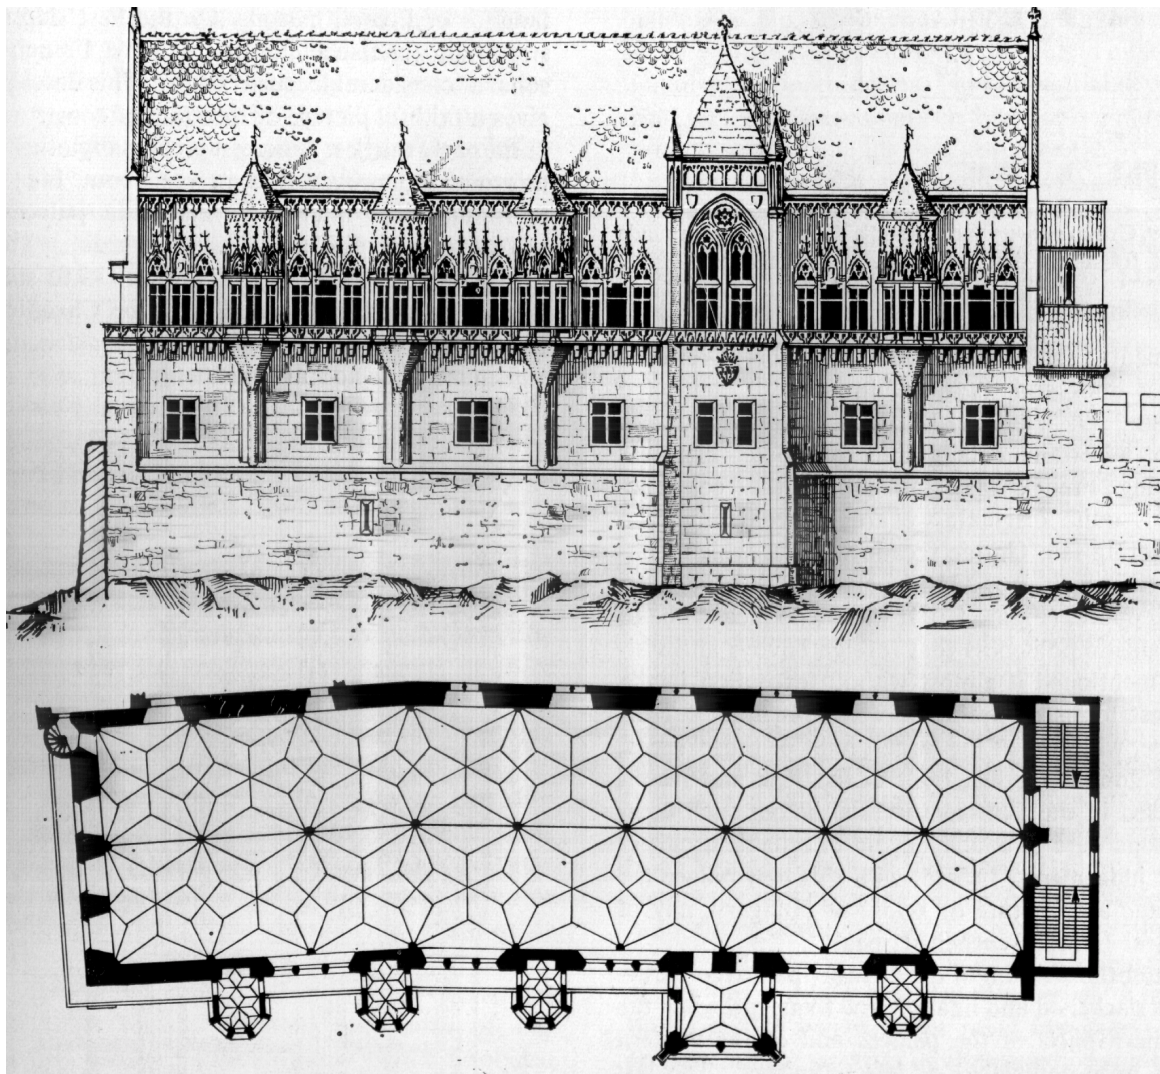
Ground plan of house No. 2 Orszaghaz Street, Budapest, Hungary.
